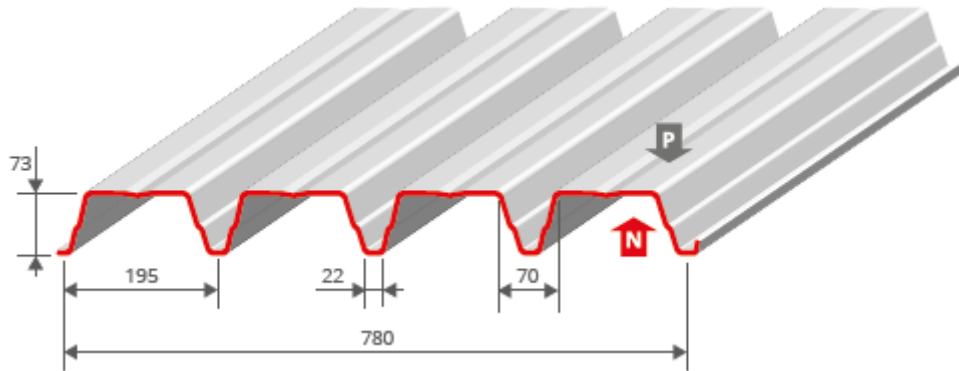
Sheeting ALTEO 73.780 - general view
